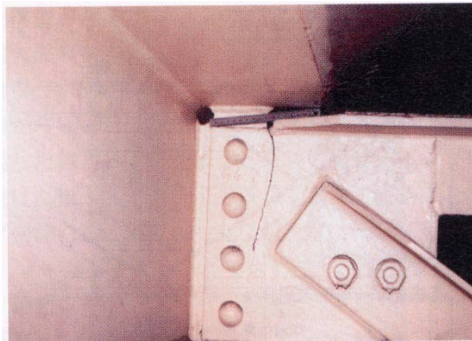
Fatigue crack in gusset plate¹⁾
